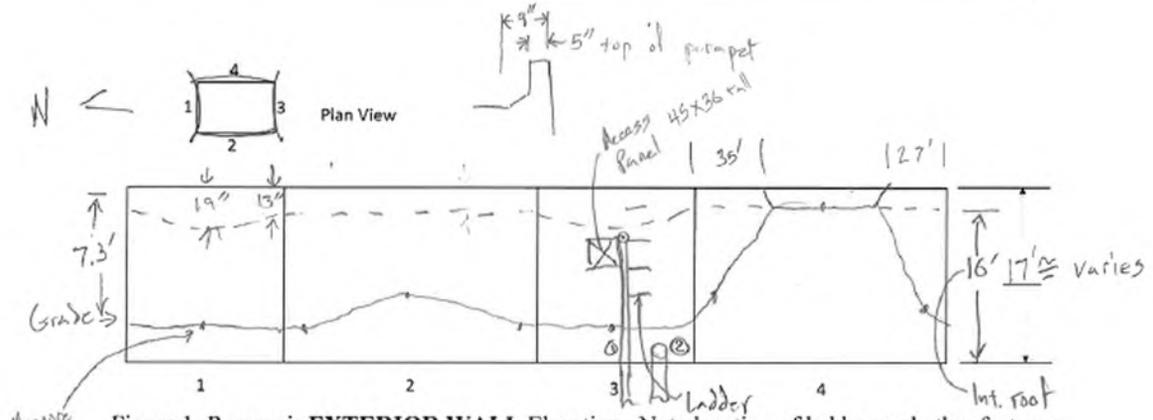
Reservoir EXTERIOR WALL Elevation- Note location of ladders and other features.
